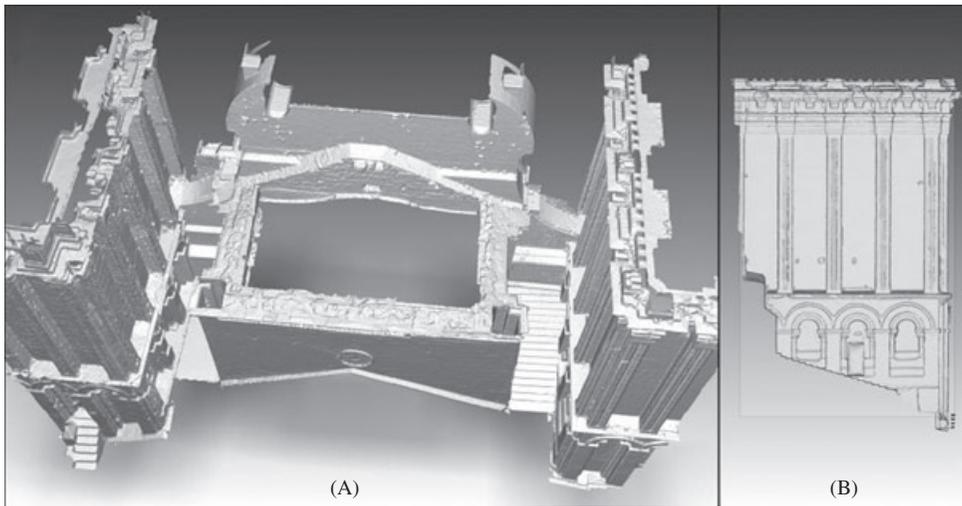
Complete 3D model of the working area. A shows a general top perspective and B the north tower façade.
